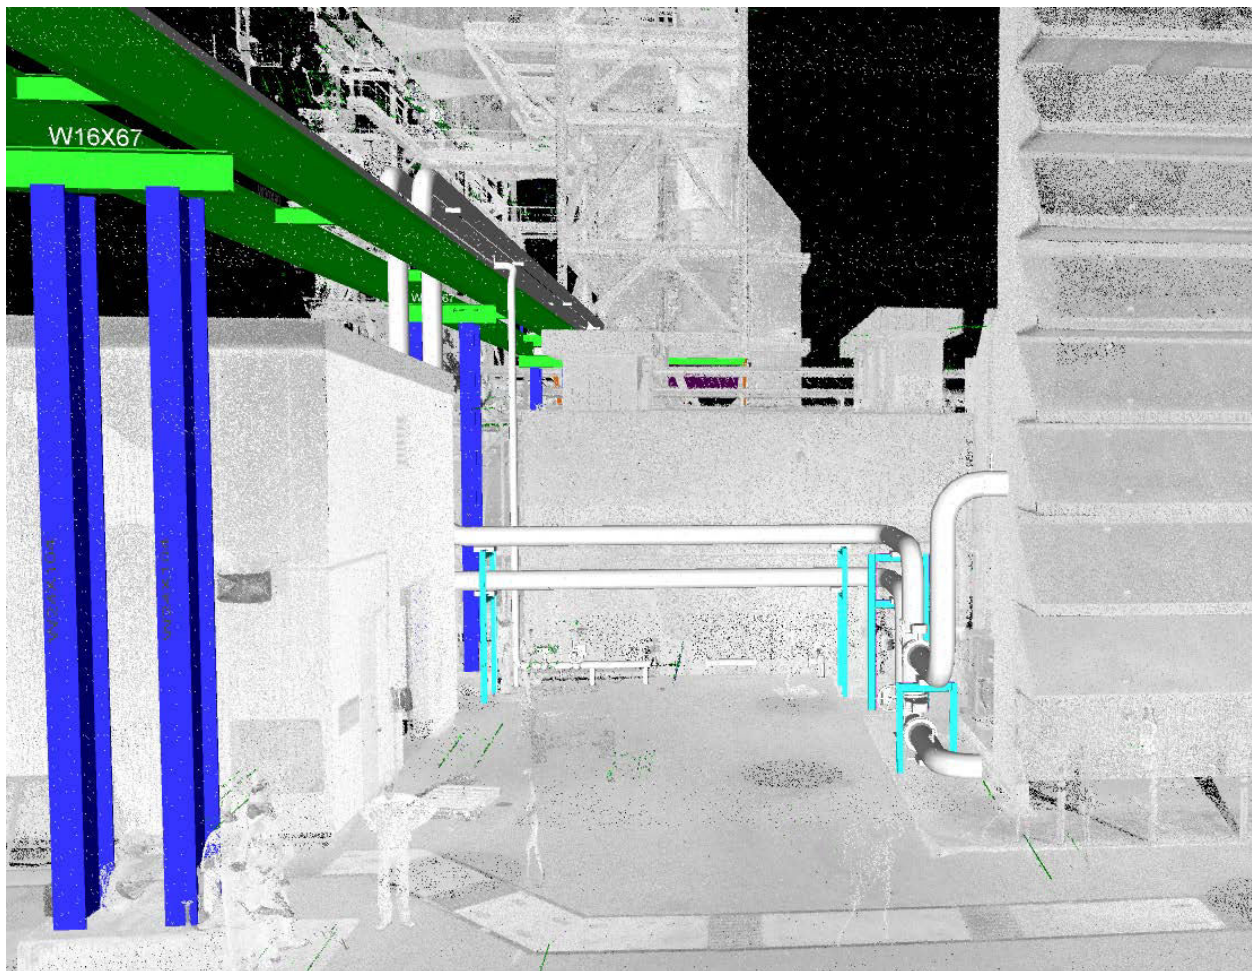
New Piping System Model View at Unit 6 (looking east)
